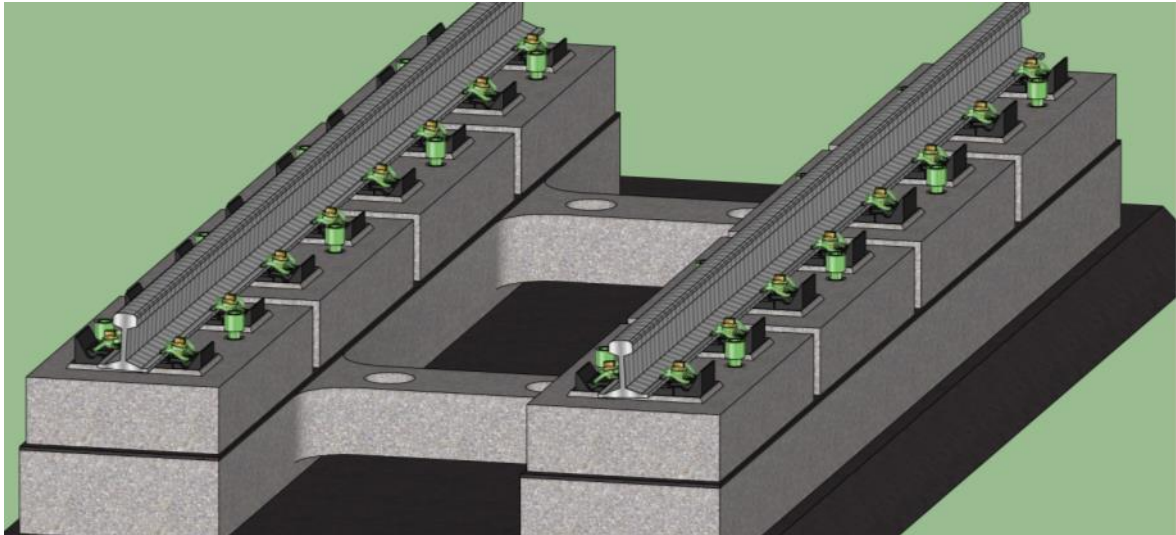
RELEASING OF FASTENERS AND FALSE SLEEPER DISASSEMBLY
